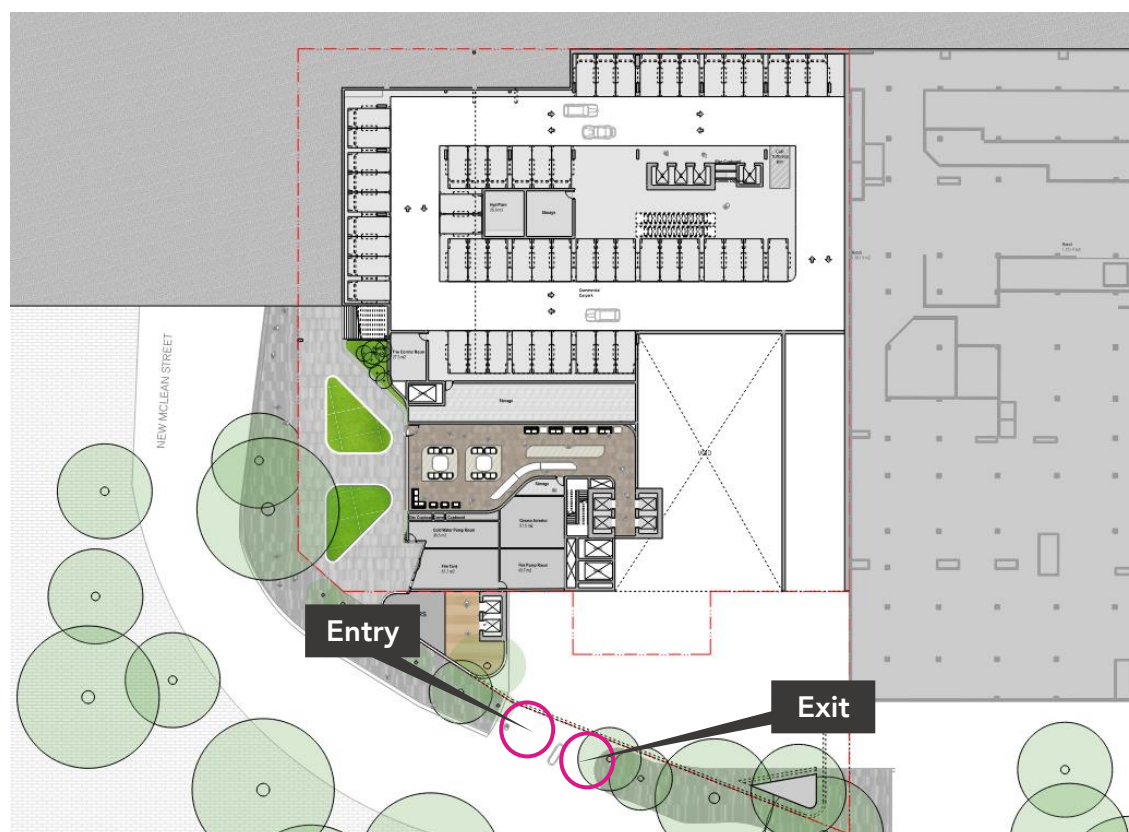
Proposed Vehicular Access Arrangement (Source: FJC Studio)
